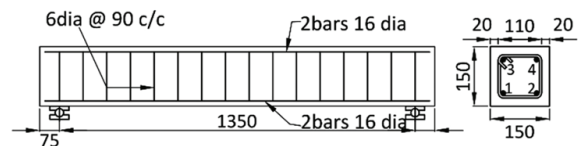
Geometry and Reinforcement arrangement of Full Scale UHPFRC Beam [15]
